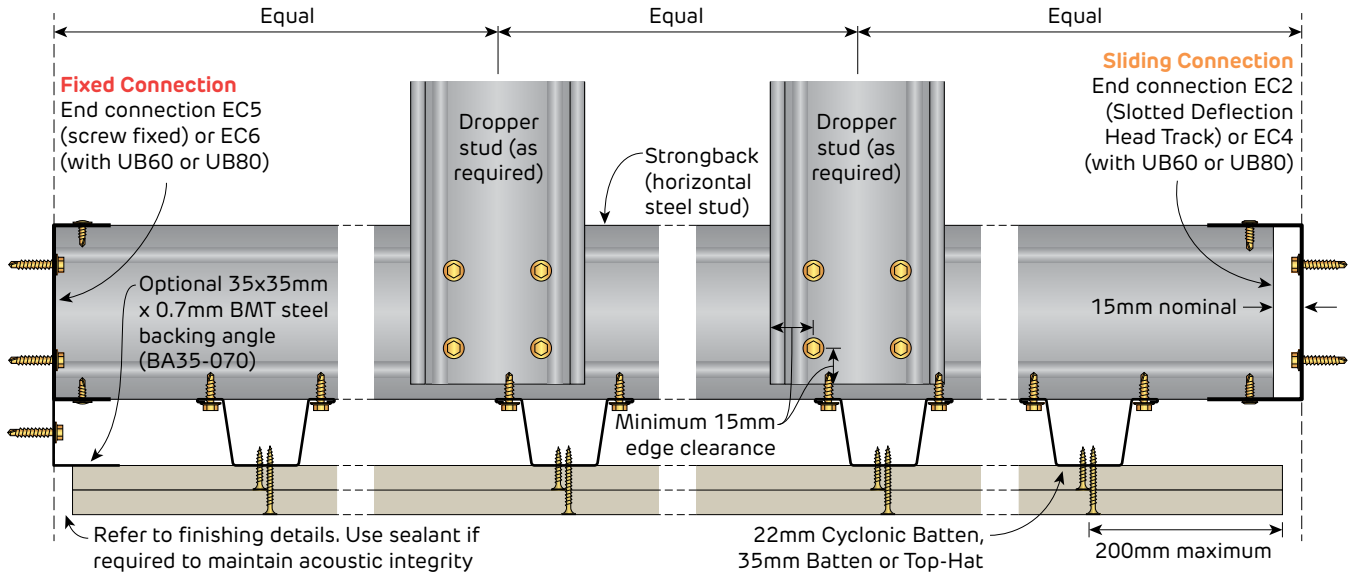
Stud Ceiling Type A3 - Fixed / Sliding
